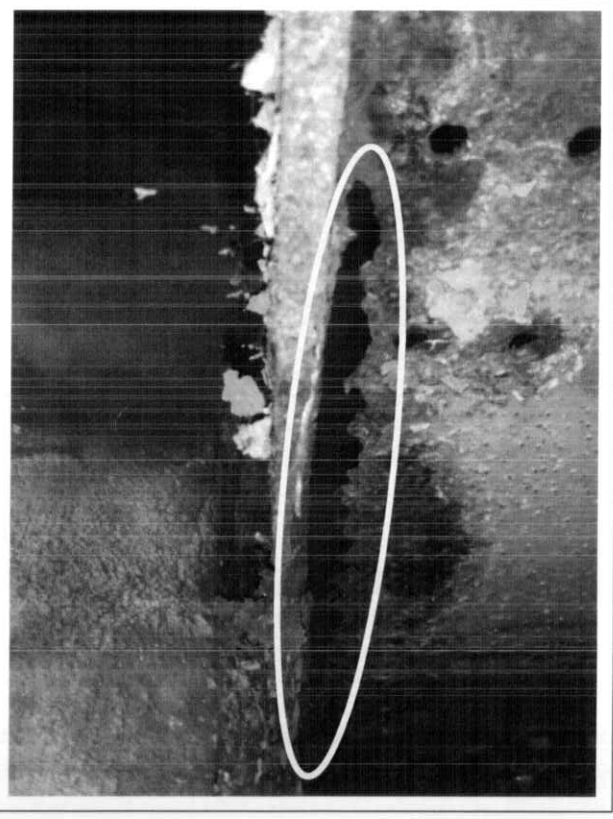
BEAM # 6 IN SPAN # 1 WITH A TORCH CUT SECTION, 7 IN. X 3 IN., REMOVED FROM THE NORTHSIDE OF THE BOTTOM FLANGE, AT CENTER OF SPAN.
